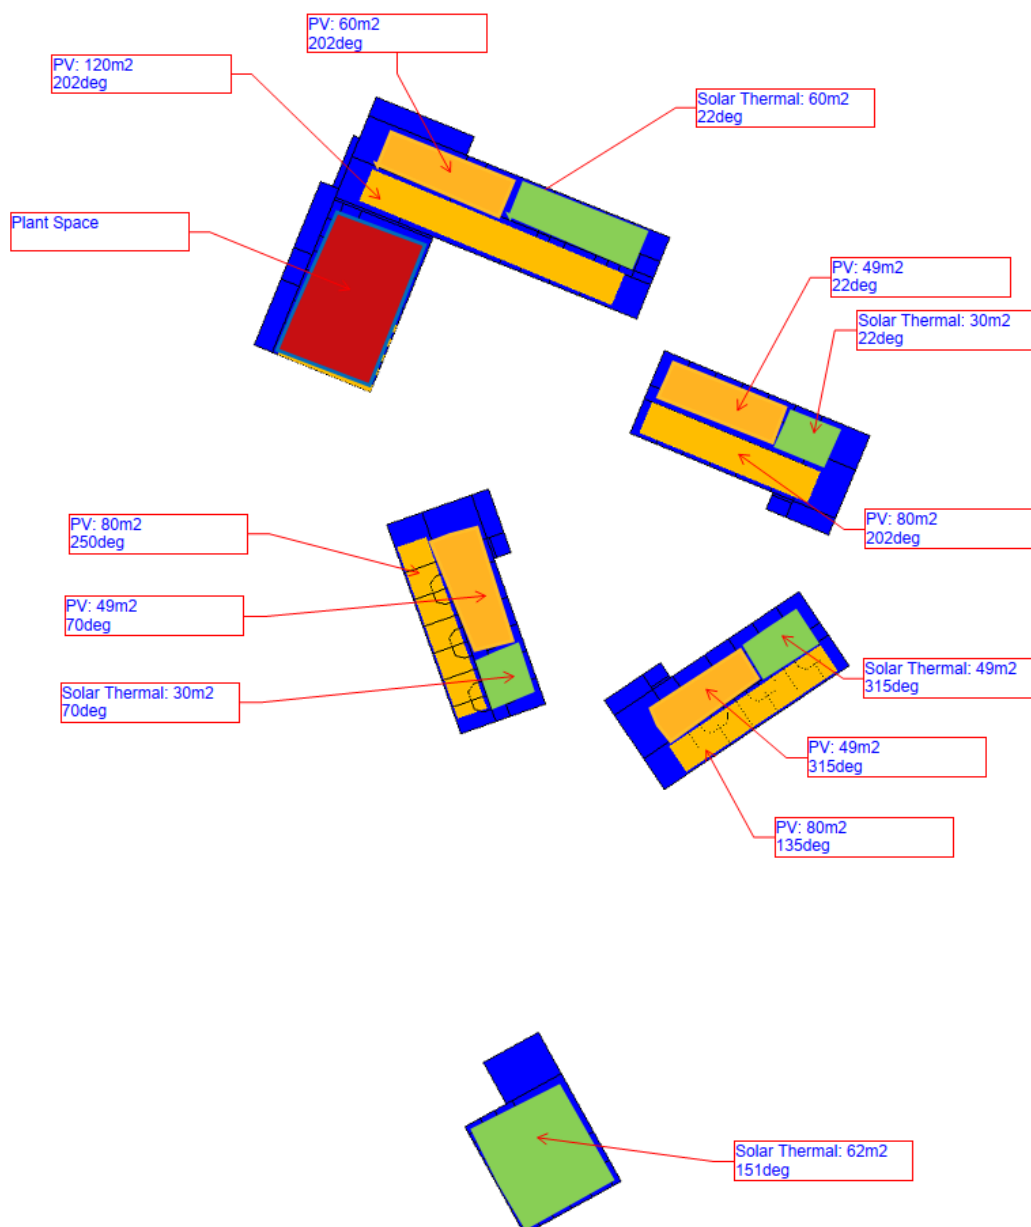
Proposed Roof Mounted PV Area (in Orange)
